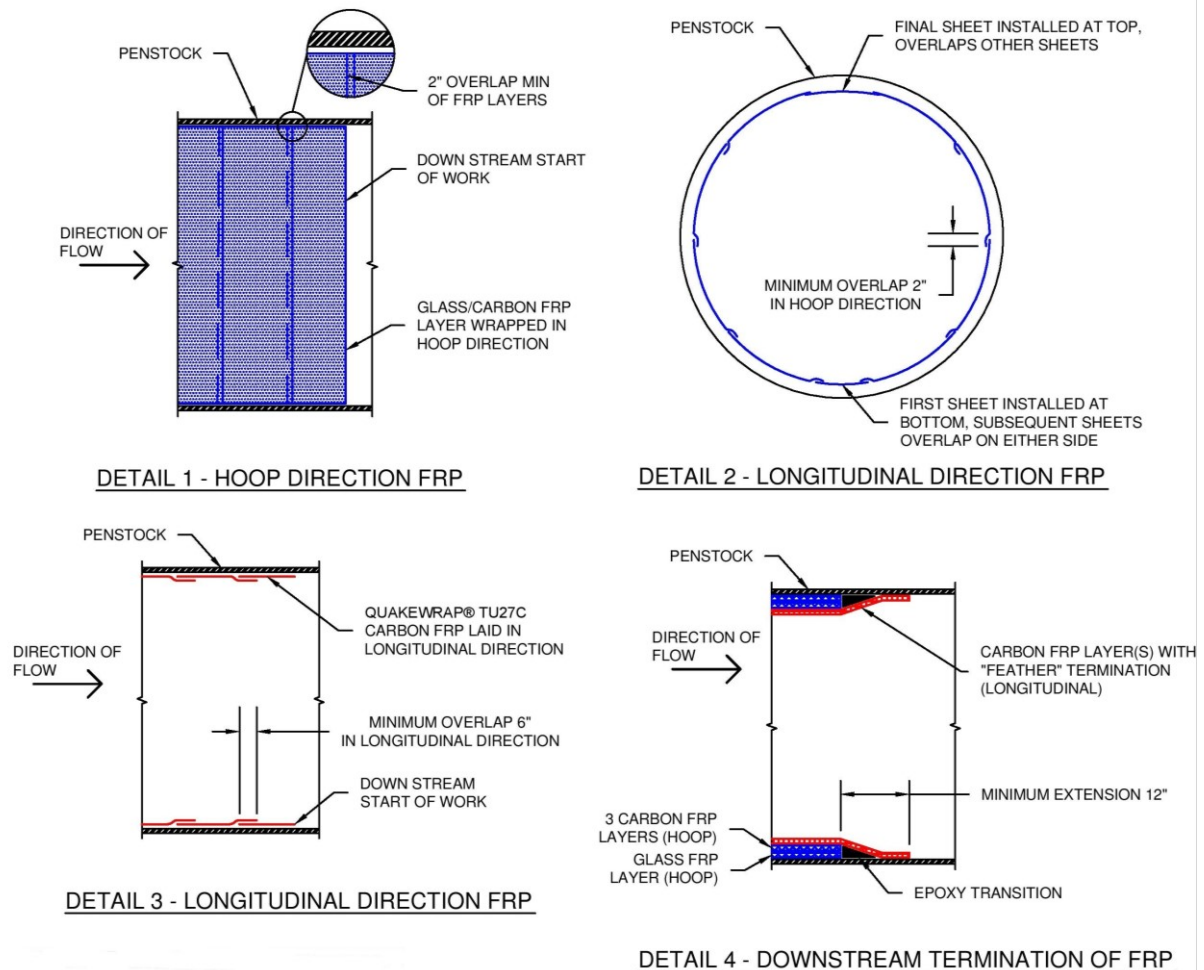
Various details of the CFRP liner for a large diameter riveted steel penstock
